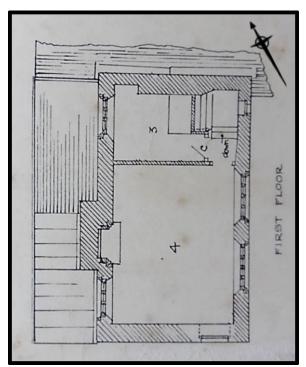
Extract from the drawing showing the first-floor plan in 1941.
